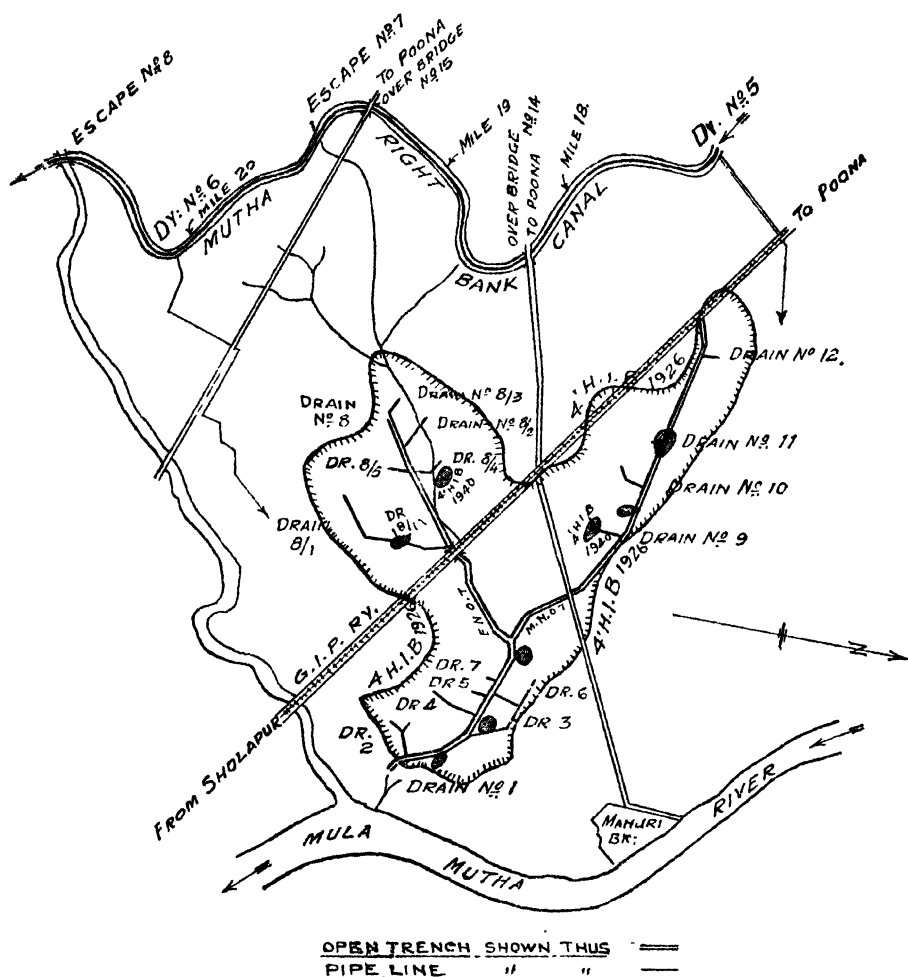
Plan showing 4 ft. H. I. Bs. before and after drainage and drainage lines, open and closed (pipe lines), Mutha Right Bank Canal, Manjri Drainage Scheme (Scale 1 in. = $\frac{1}{8}$ mile)
